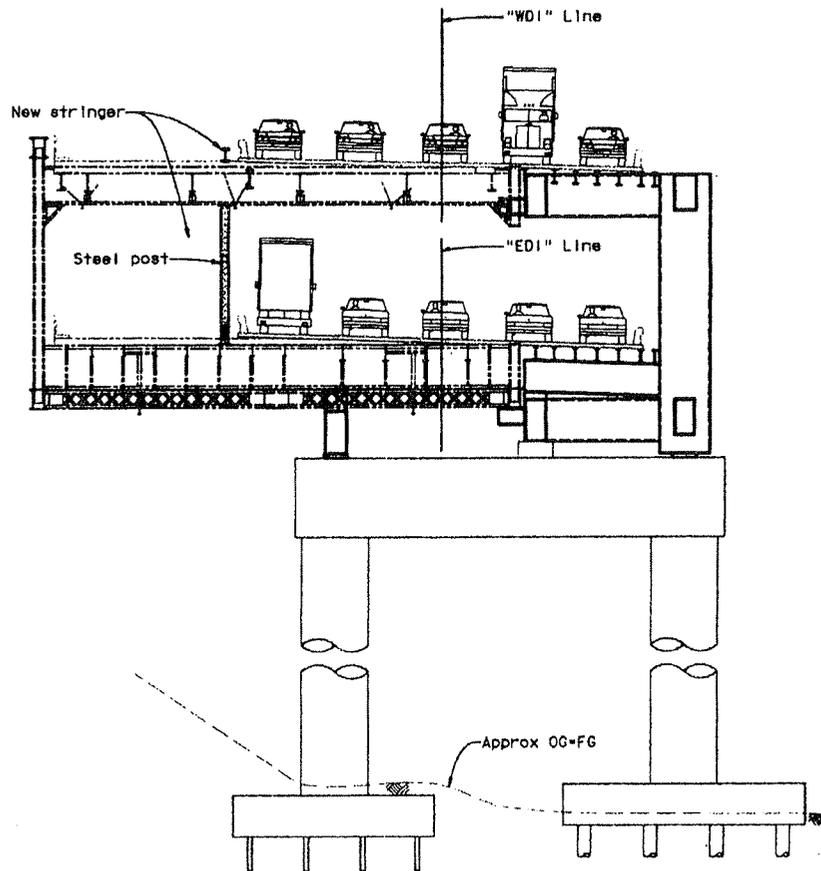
Stage 7 – Placement of Upper Deck Support
